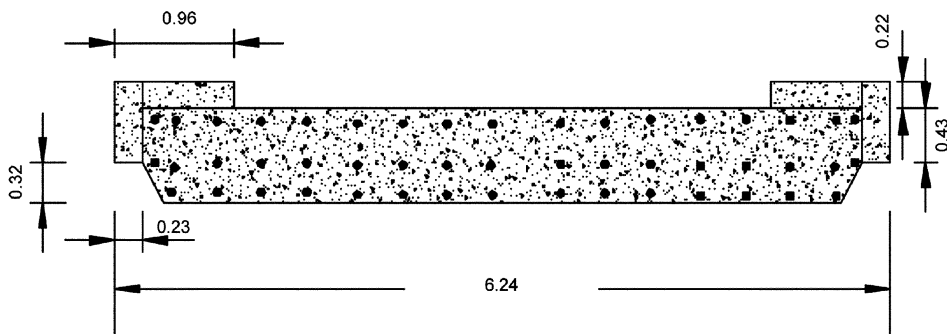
Typical cross-section of the reinforced concrete continuous slab (dimensions in meters)
